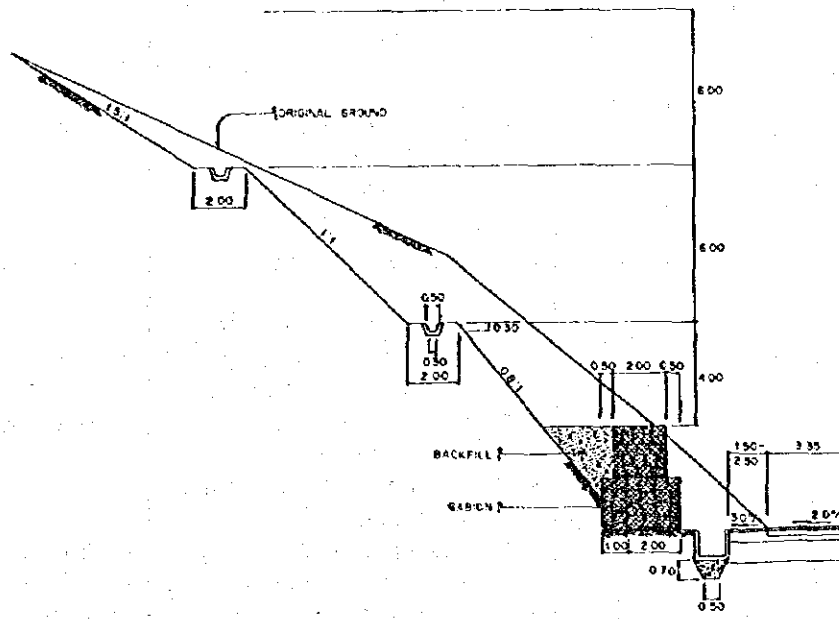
SLOPE PROTECTION WORK AT KM 1240+150
